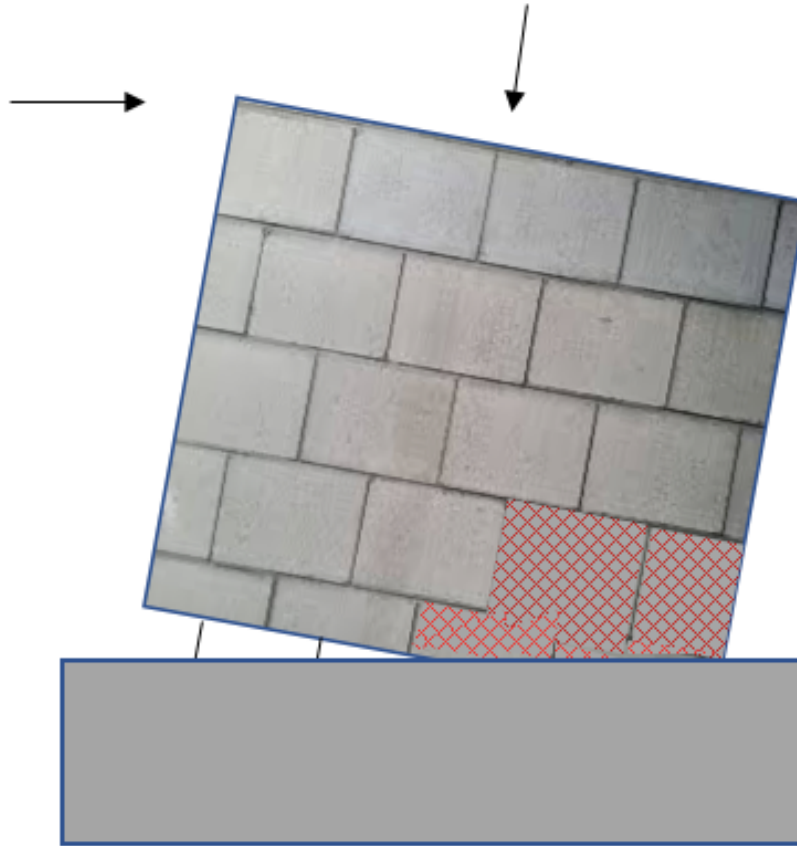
Illustration of the isolated crushing blocks of a reinforced masonry wall that has failed due to a shear crushing failure
